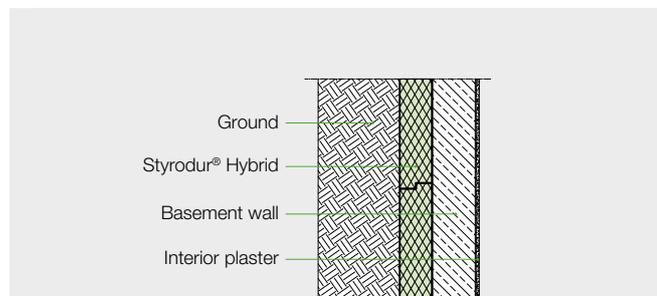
Basement wall with exterior thermal insulation layer, adjacent to the ground.
